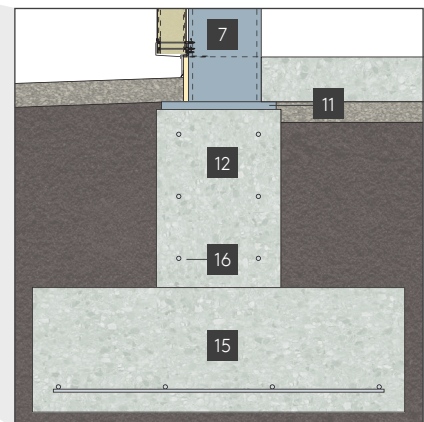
Structural bay and foundation detail of the building using the mineral fiber IMP.
